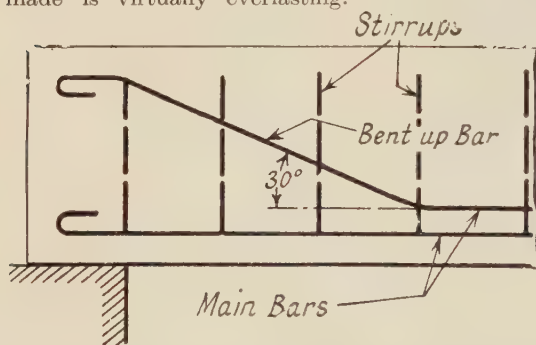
This diagram shows how steel bars are arranged in a concrete beam so that it can carry great weight along its length. The main bars are placed longwise so that they resist the pressing-down force. The bars are joined together by shorter U-shaped bars called stirrups (shown in the small top drawing), which serve to prevent the concrete from splitting along its length.
